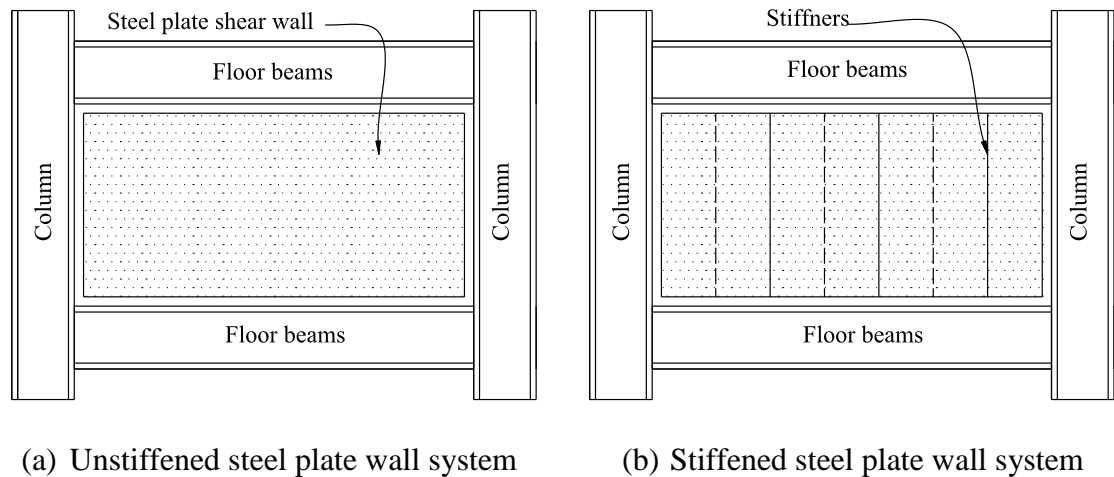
Steel plate structural walls (Astaneh-Asl 2001)
